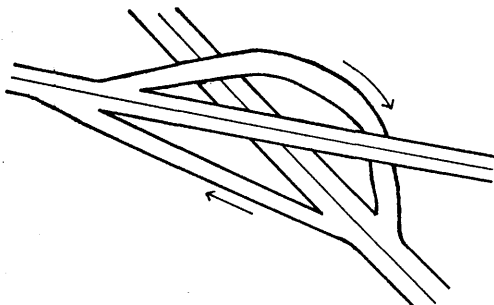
TYPICAL LAYOUTS OF RESTRICTED ACCESS JUNCTIONS
